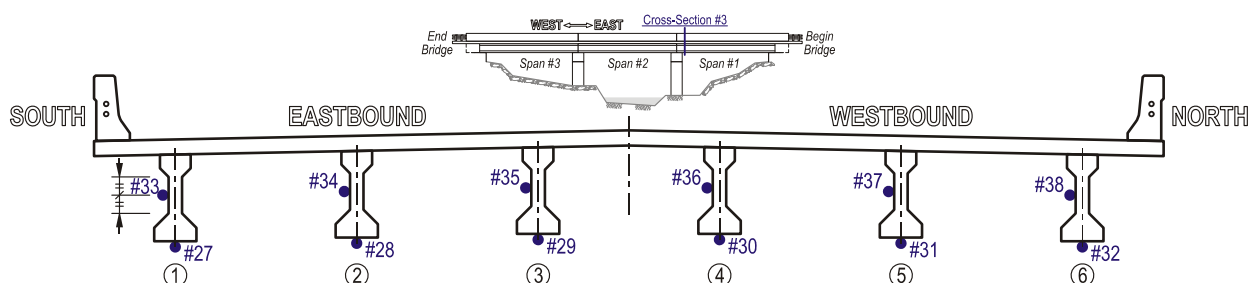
Location of the strain gages in the cross-section #3 for the tested bridge
